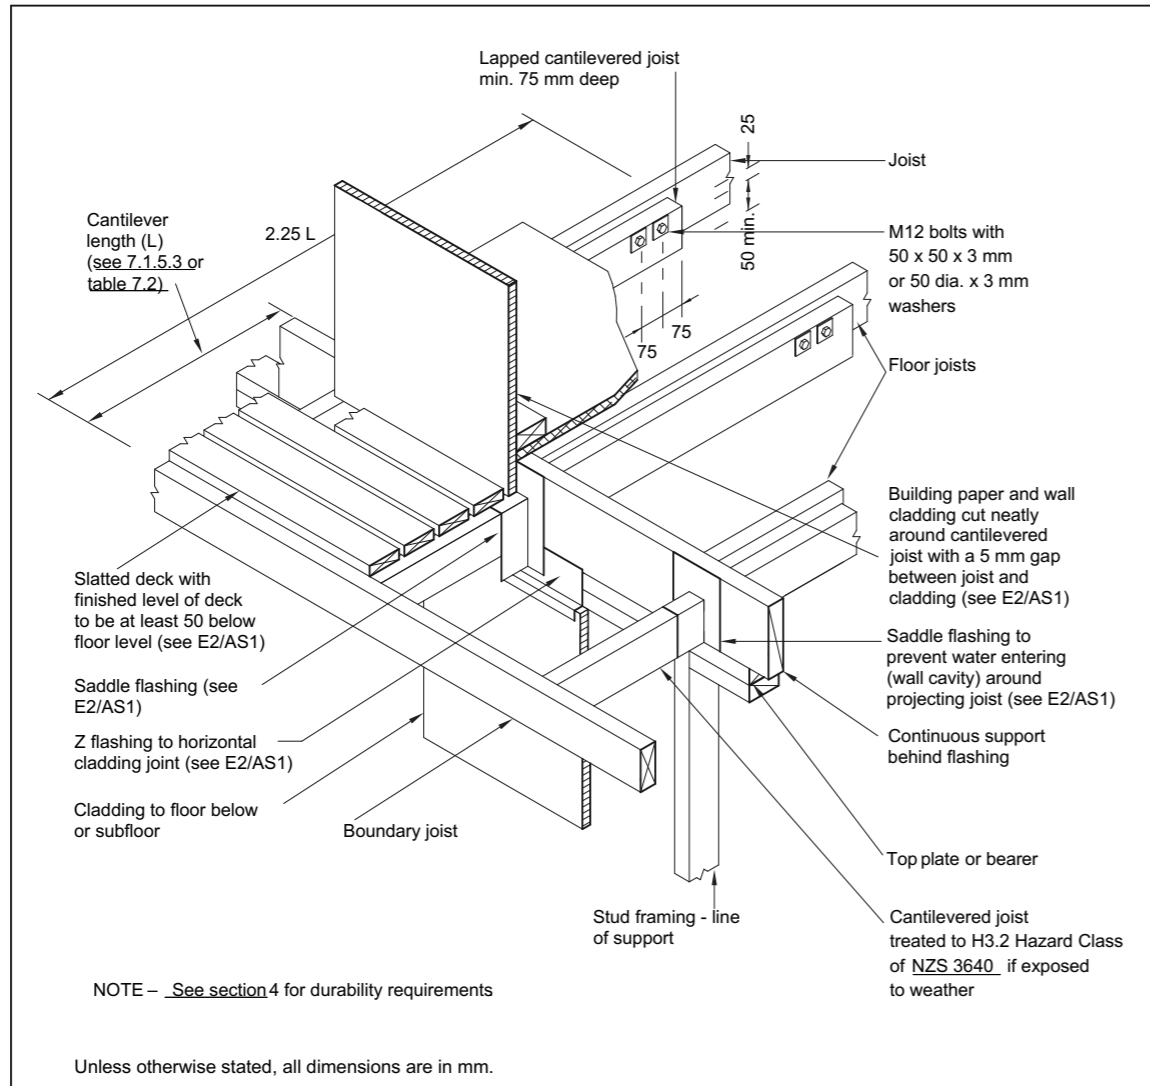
Lapped cantilevered joists (stepped/notched) (see 7.1.5.3)
